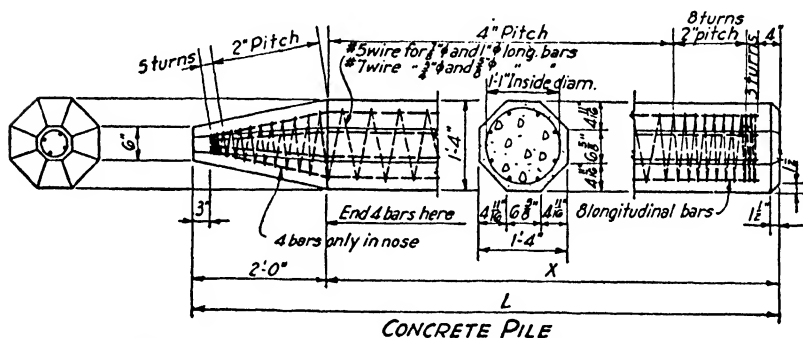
Standard Reinforced-concrete Pile of American Railway Engineering Association.
